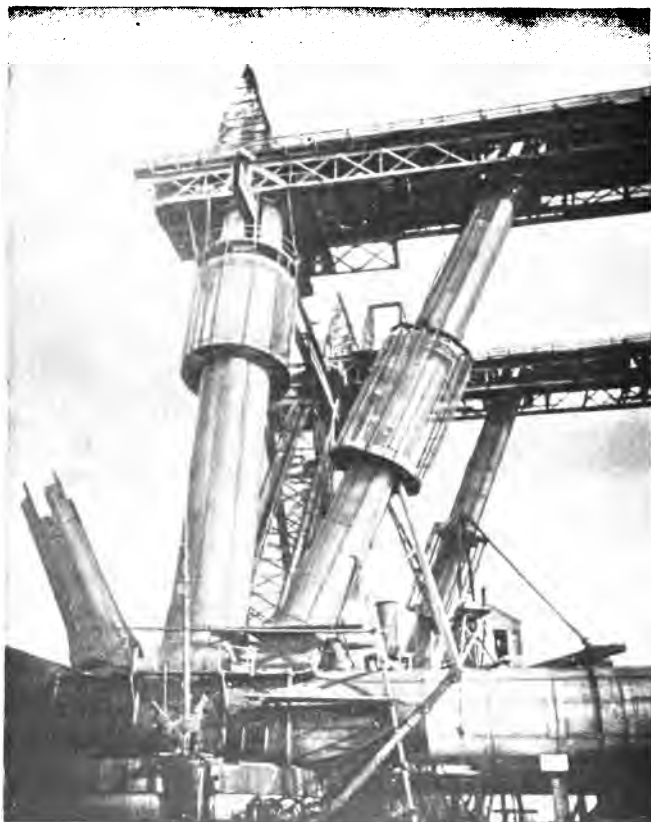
The Fife Tower, Forth Bridge. Observe the rising platforms—supported by cross girders projecting through the columns—and the riveting cages below.
